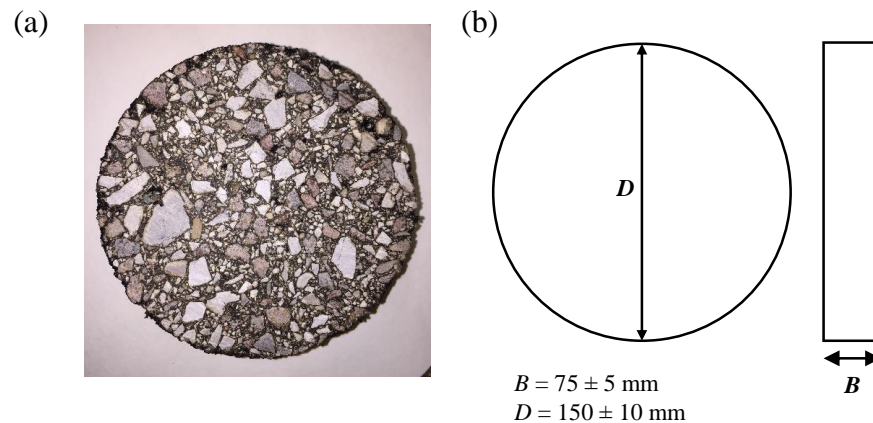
Indirect tension (IDT) specimen (a) photo and (b) dimensions
